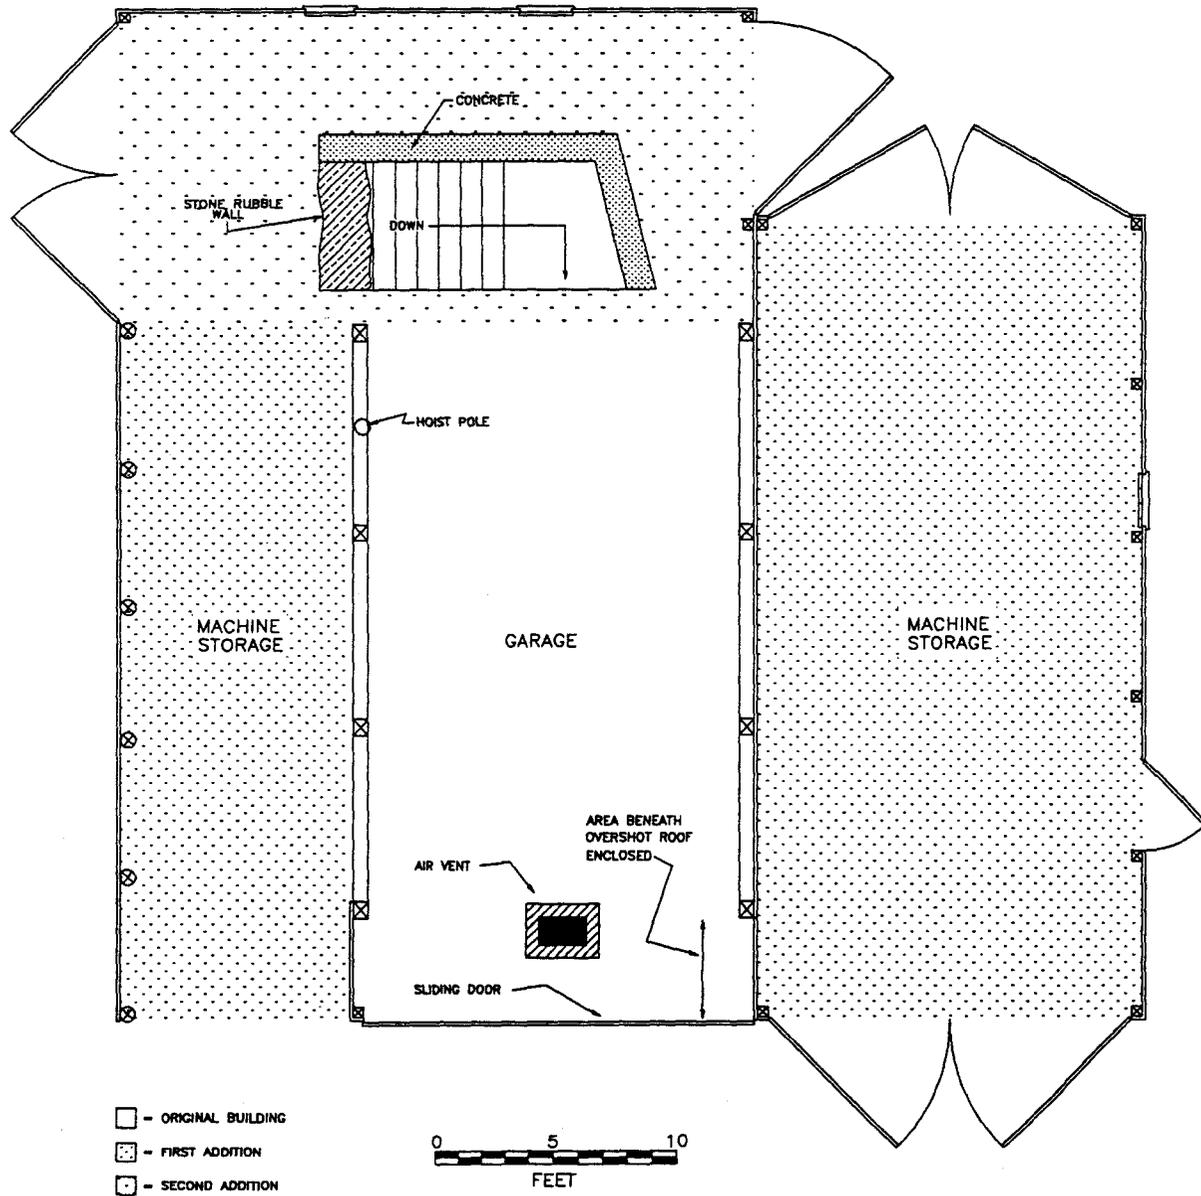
Floor plan of the Wine Press Building at the Merkel Farmstead.
